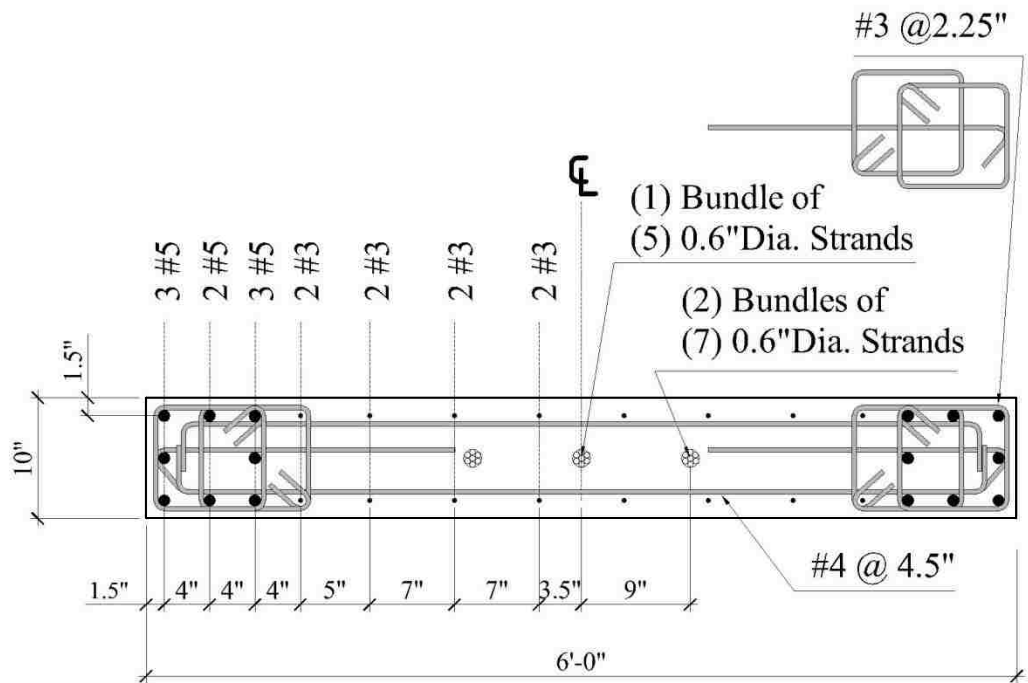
Wall cross-sectional elements included for Wall 1 and 2
